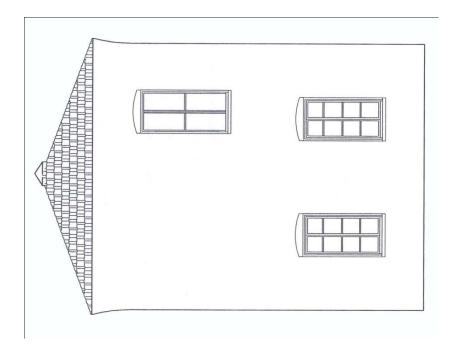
Right Elevation of 19-Hamam Street Scale: 1/75
